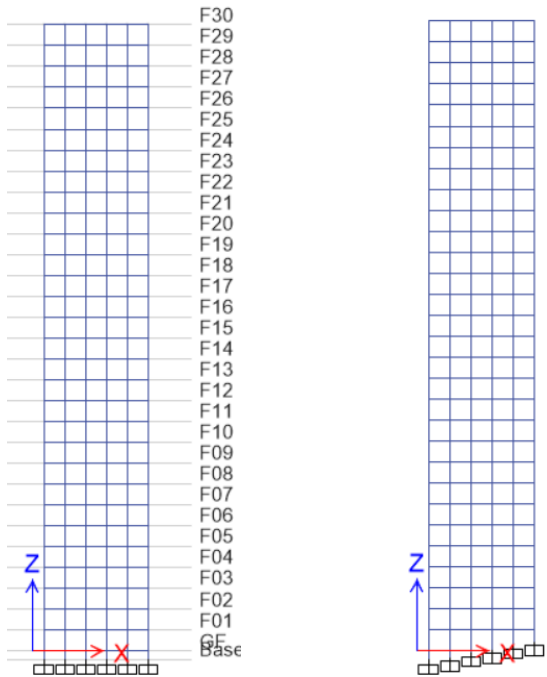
With-out Bracing Steel frame on Plain Ground and 10-Degree Slope
